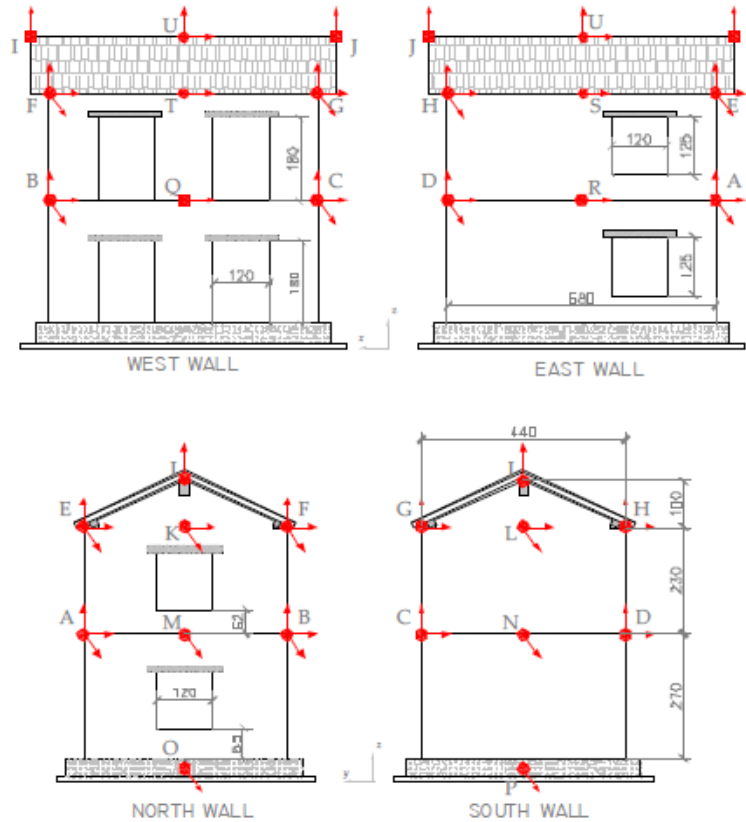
Design of constructed specimen (Magenes et al., 2010).
